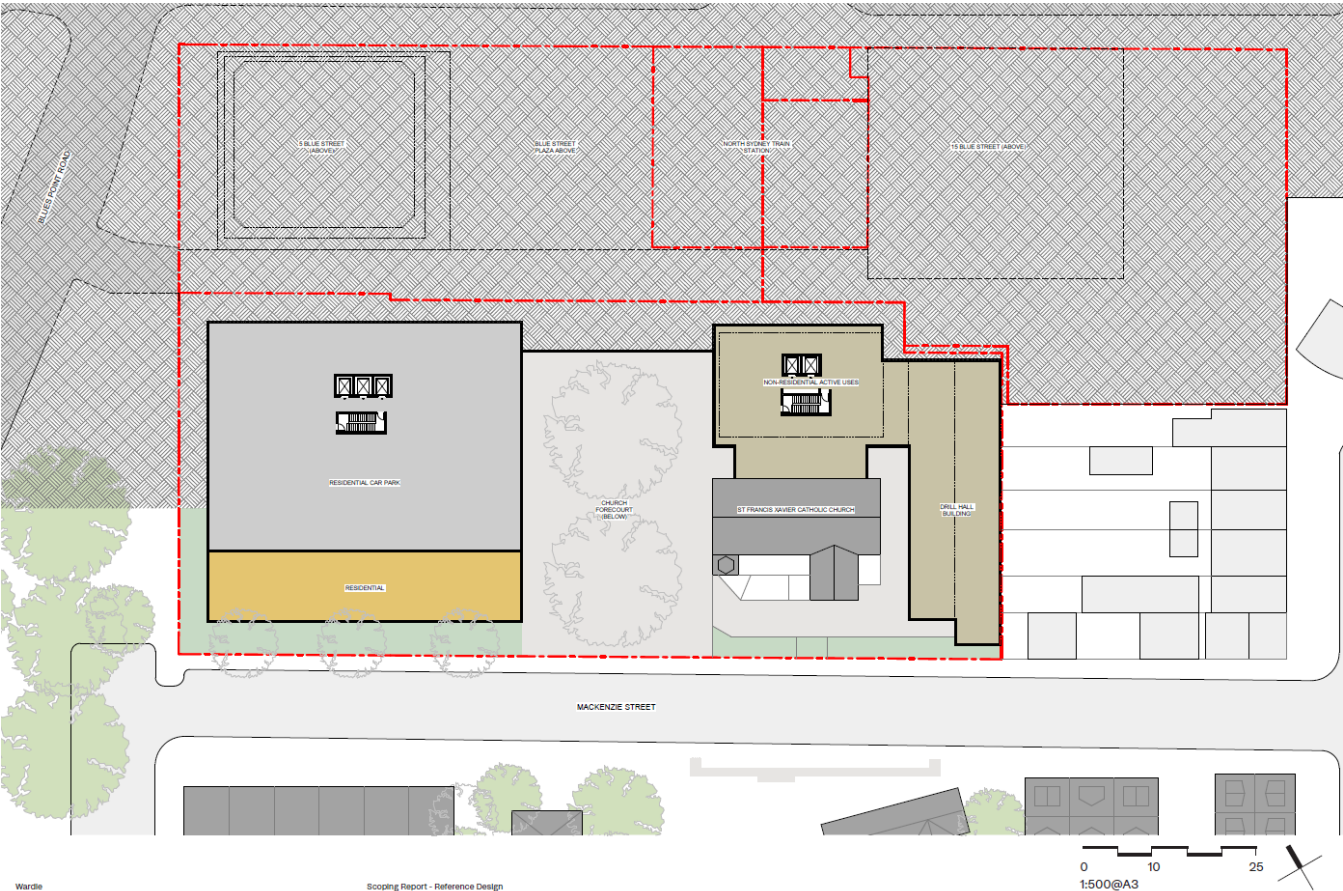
Indicative Ground Floor Plan (Wardle 2025)
